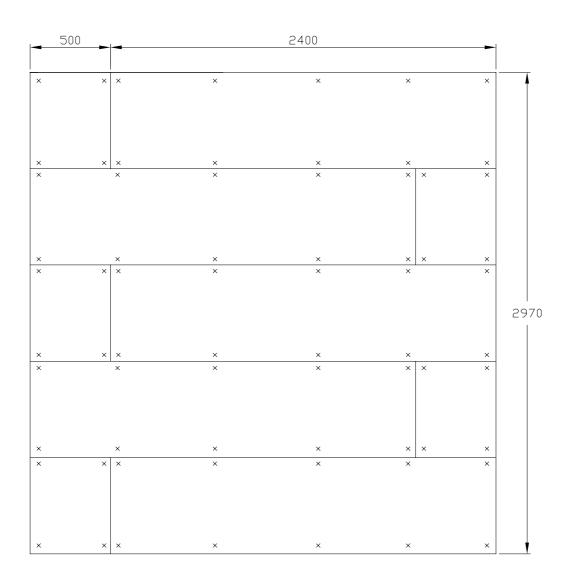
Board and fixings layout of 19mm Plank as viewed from the exposed face.
